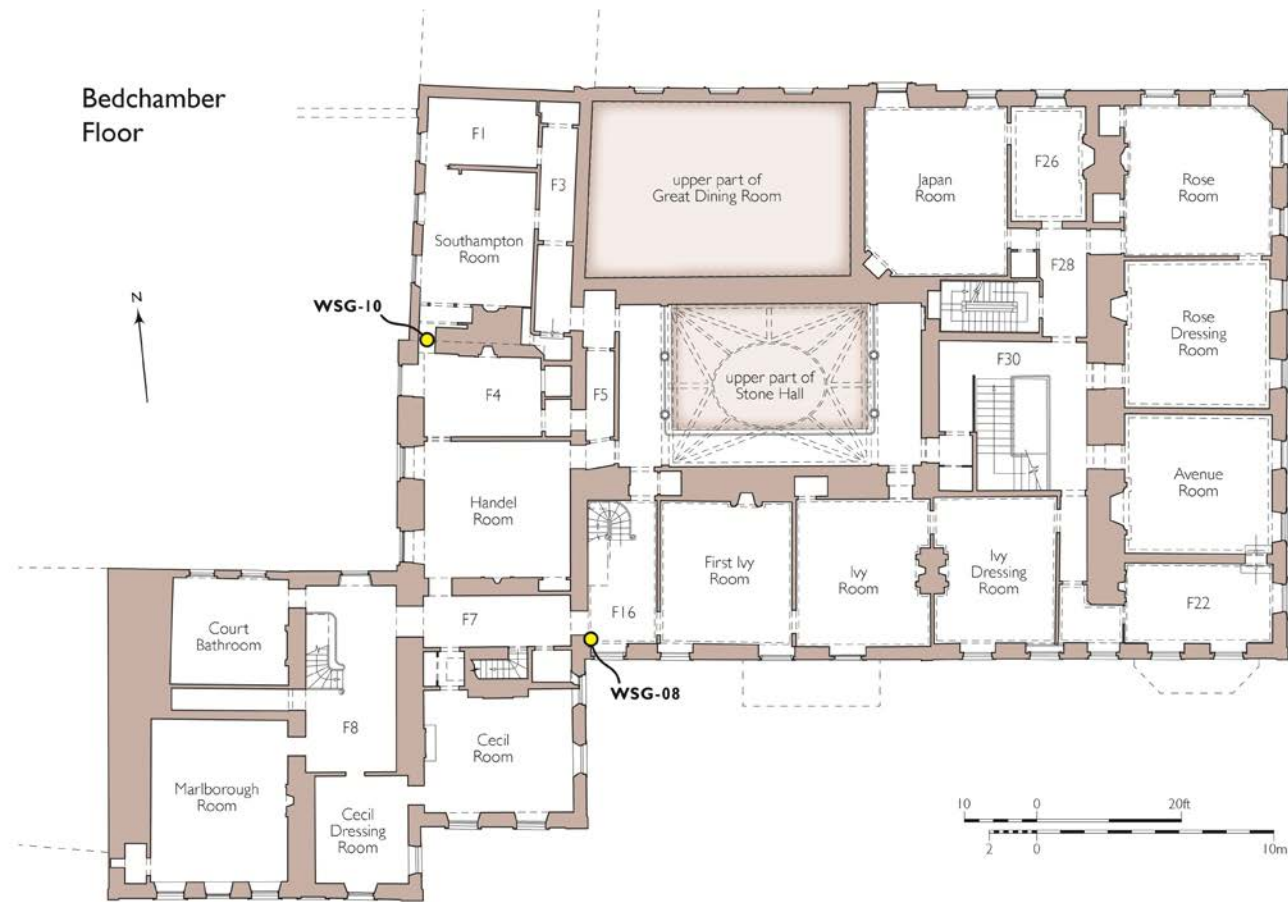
Plan of the bedchamber floor of St Giles House, showing the location of bricks sampled for luminescence dating (after Phillip Hughes Associates 2017)
